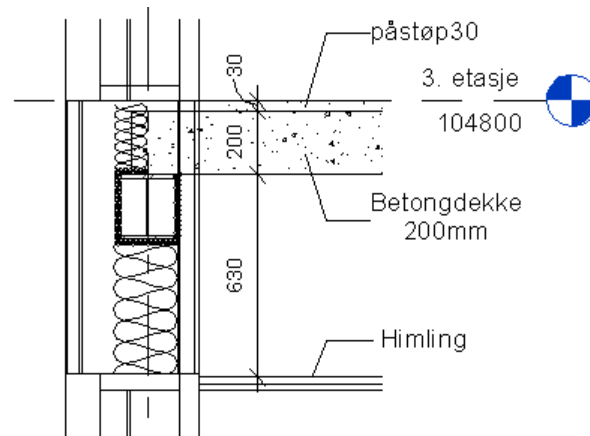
Detail extracted from the Revit model of the ZEB office building (Betongdekke – refers to hollow core elements)
